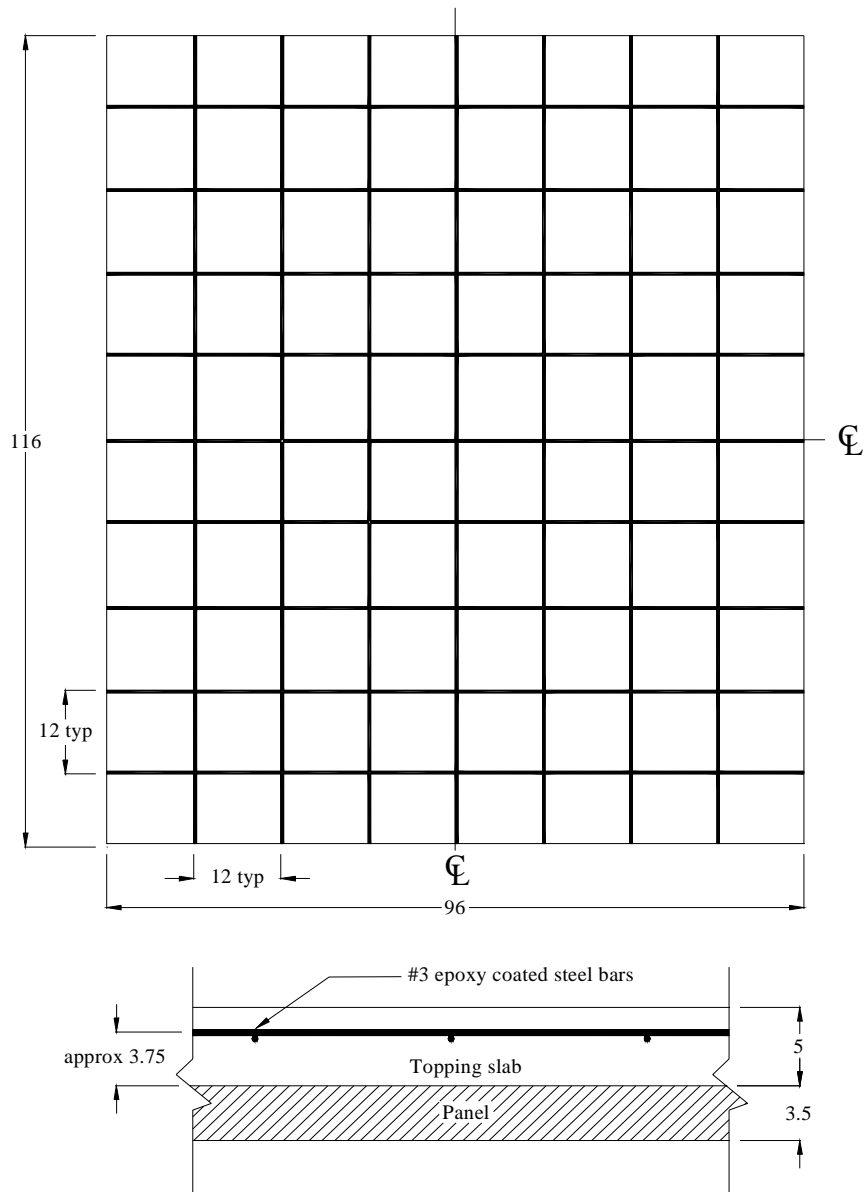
Cross-section and plan view of panel and topping slab (all values in inches) (1 in. = 25.4 mm)
